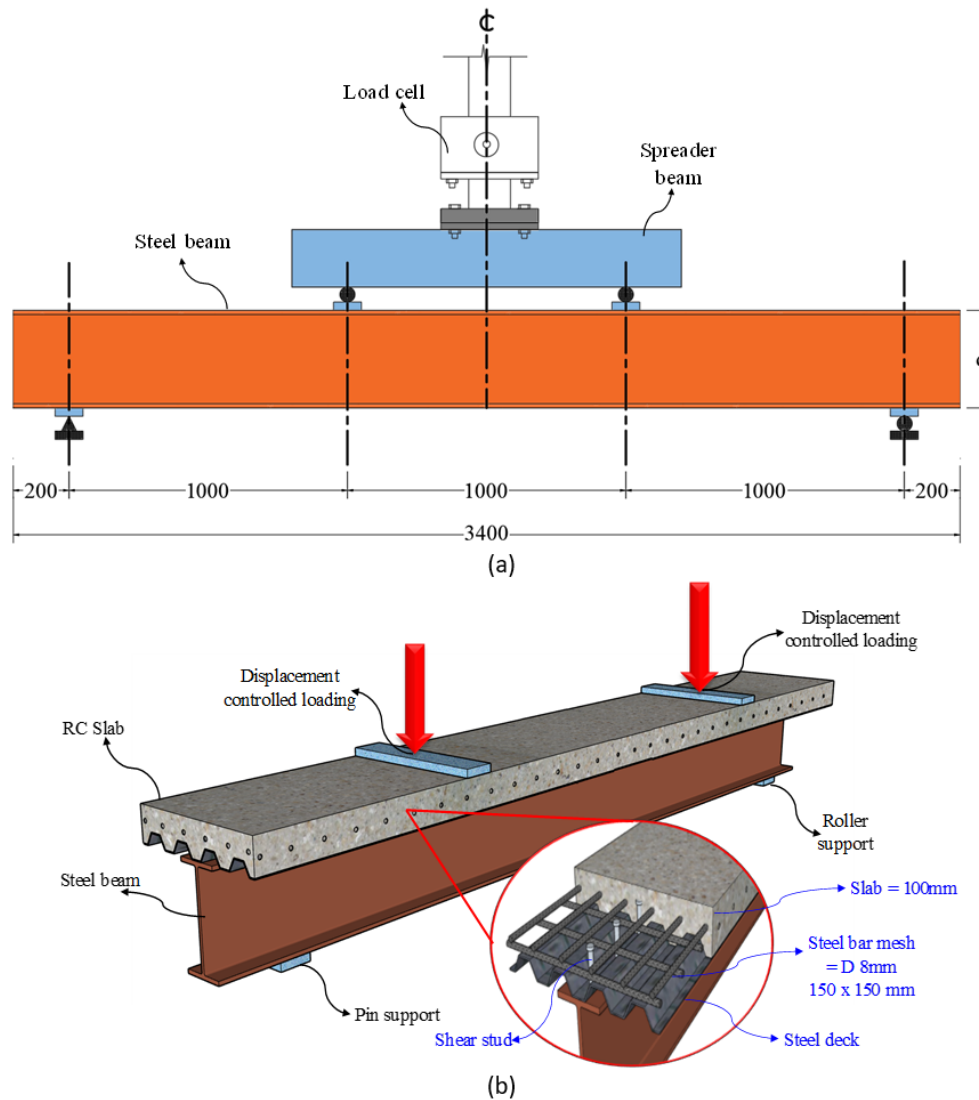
Dimensions and detailing of FE analysed steel I-beam (Note: All dimensions are in mm): (a) Elevation of the typical steel I-beam; (b) Boundary and loading conditions of a typical steel I-beam with slab.
